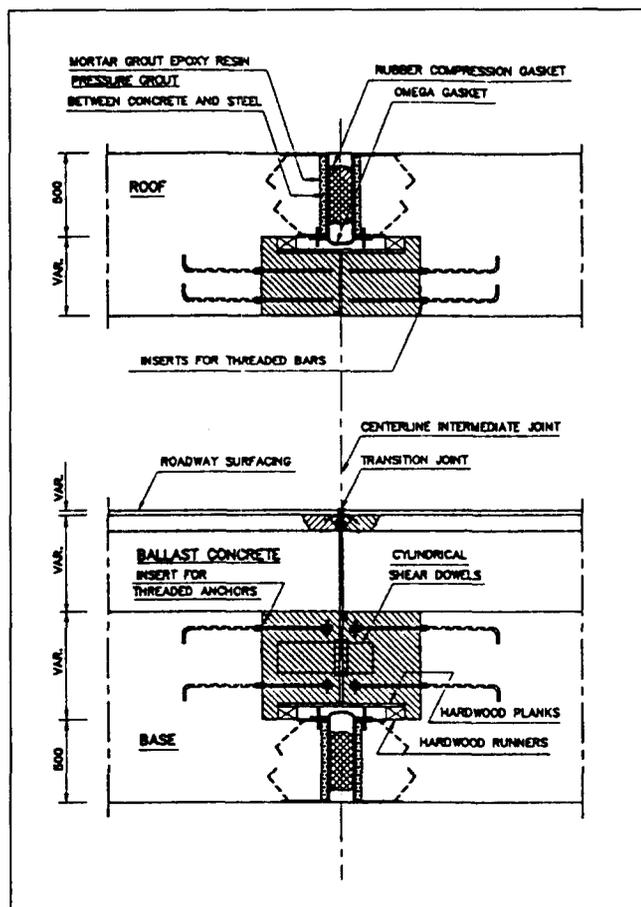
Intermediate flexible joint for concrete tunnels (Dutch solution).
